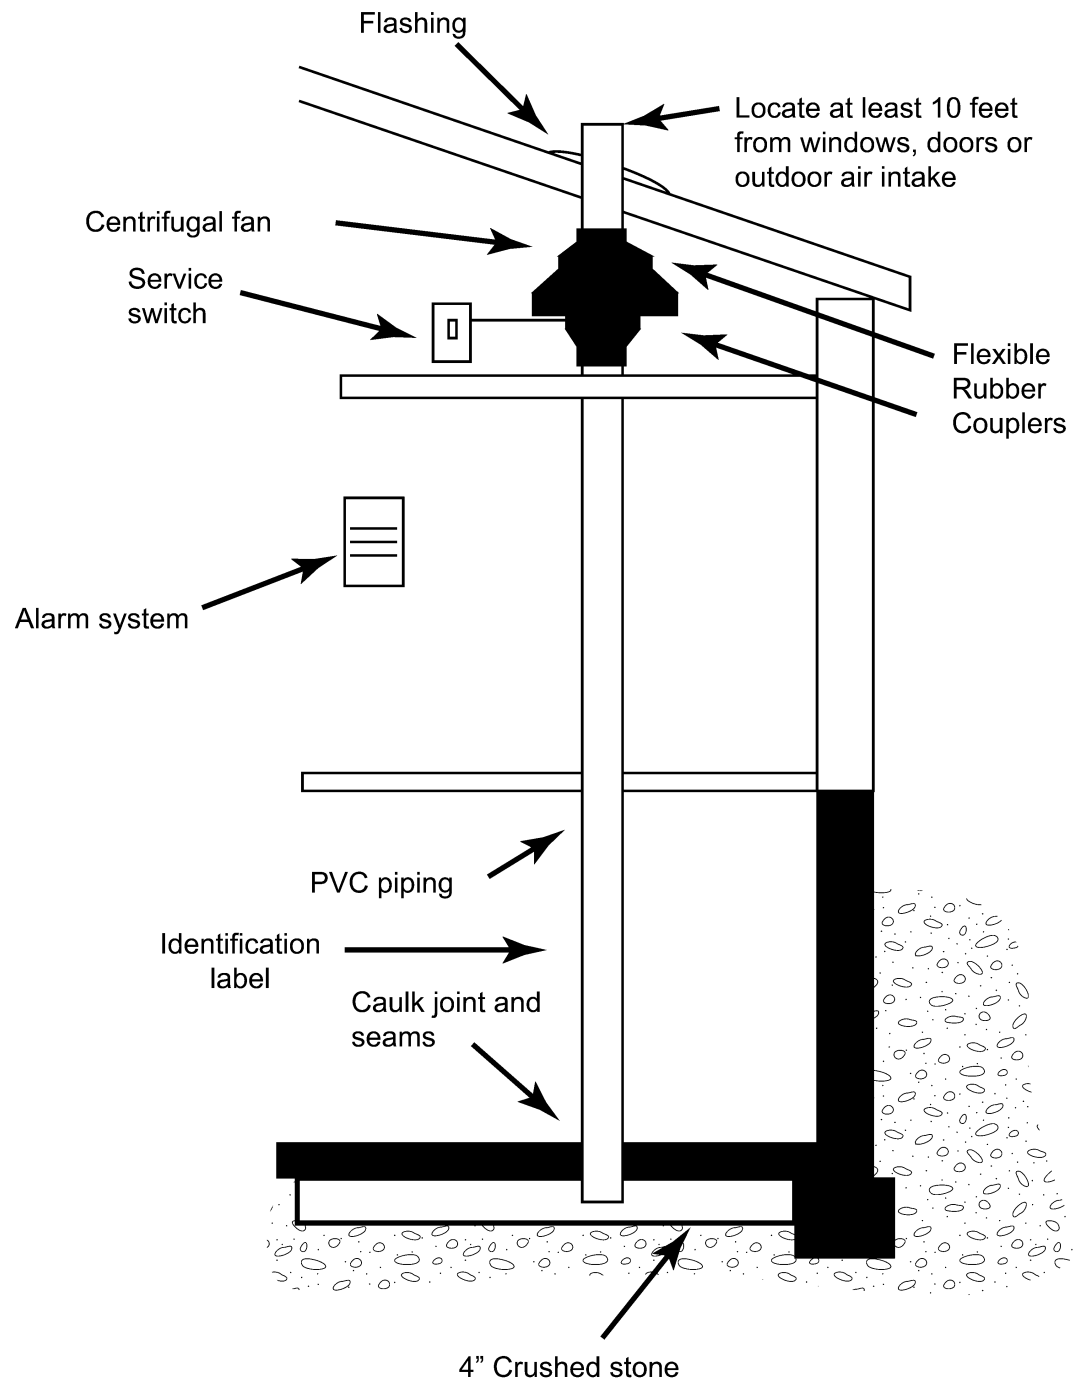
Typical Attic Sub-Slab Depressurization Installation, Source: MURC
